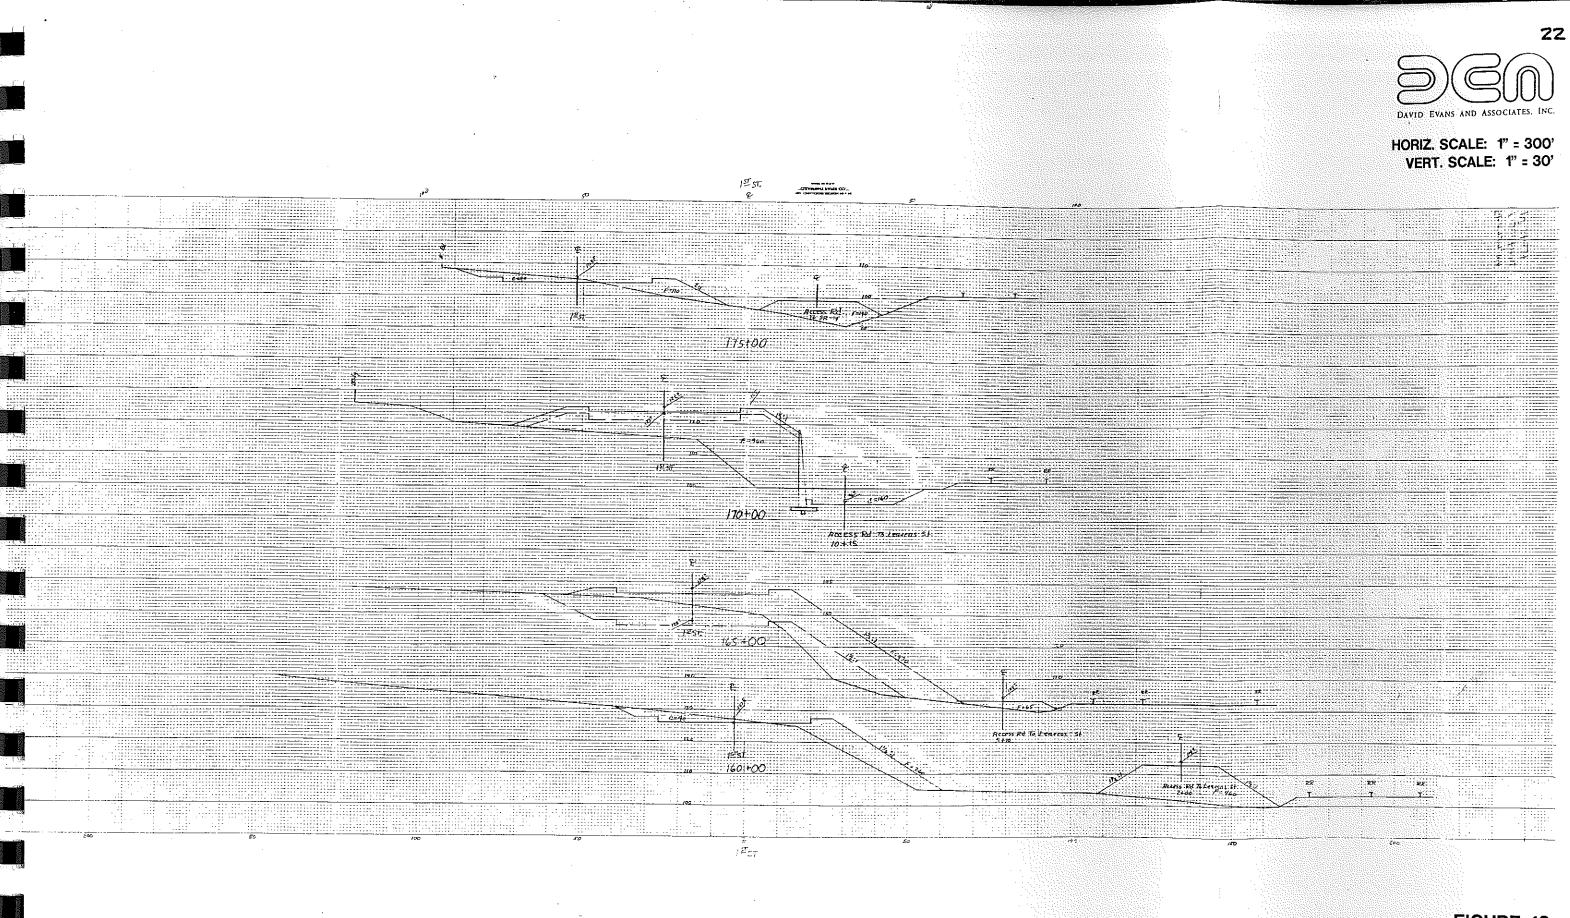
CROSS SECTIONS FOR 1ST STREET PROFILE OPTIONS to Frank Johns Road as shown in Figure 14.
